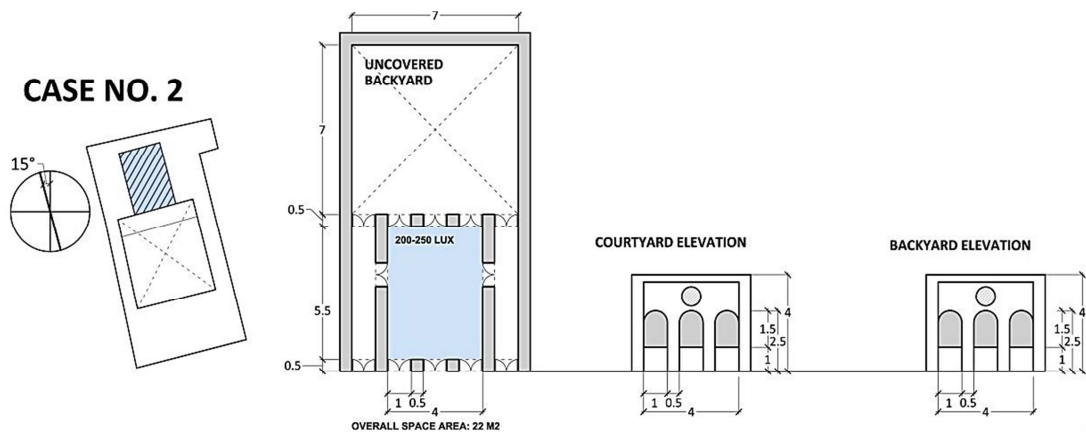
Two dimensional drawings, case no. 2. Drawn by author
